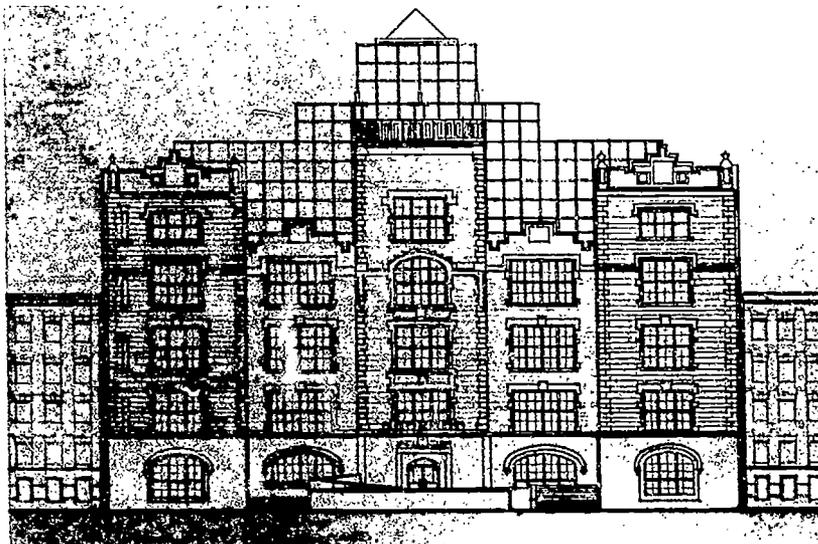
City College Architectural Center, project for Harlem, 148th Street elevation
